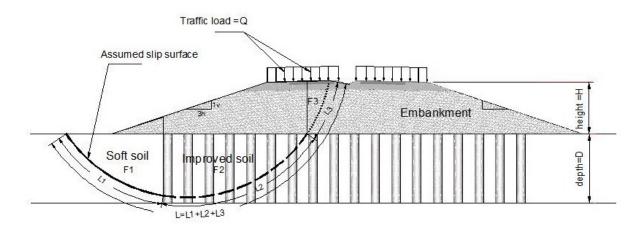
Cross-section of a typical embankment constructed on lime-cement columns
